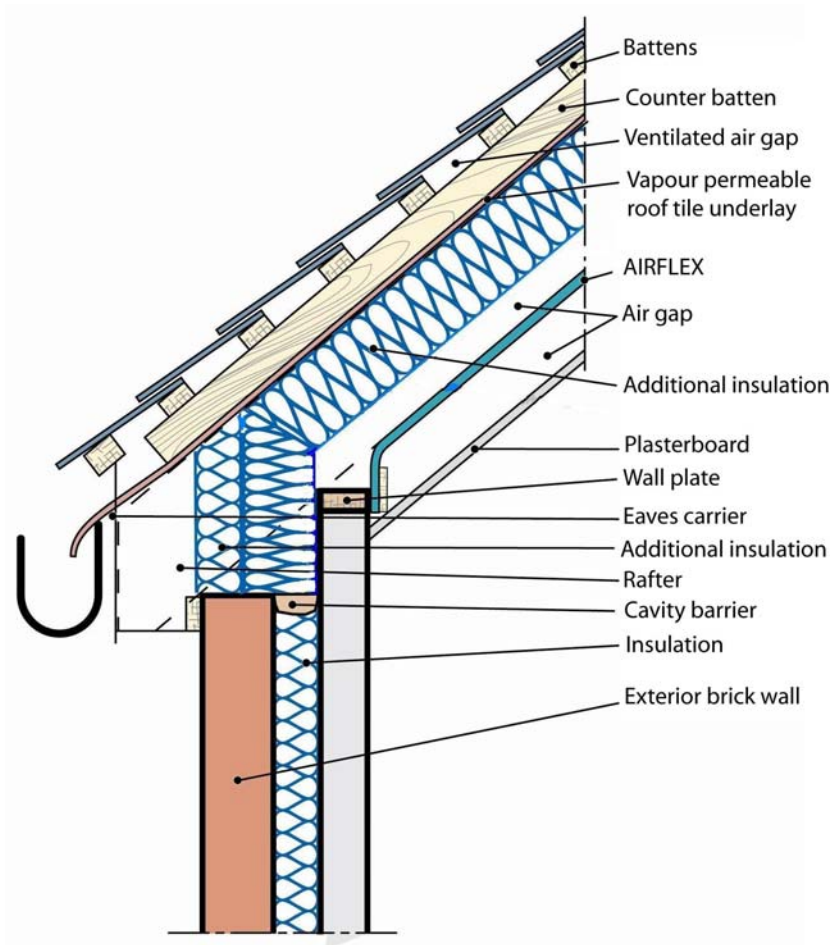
Application of Airflex with additional insulation – Eaves Detail
